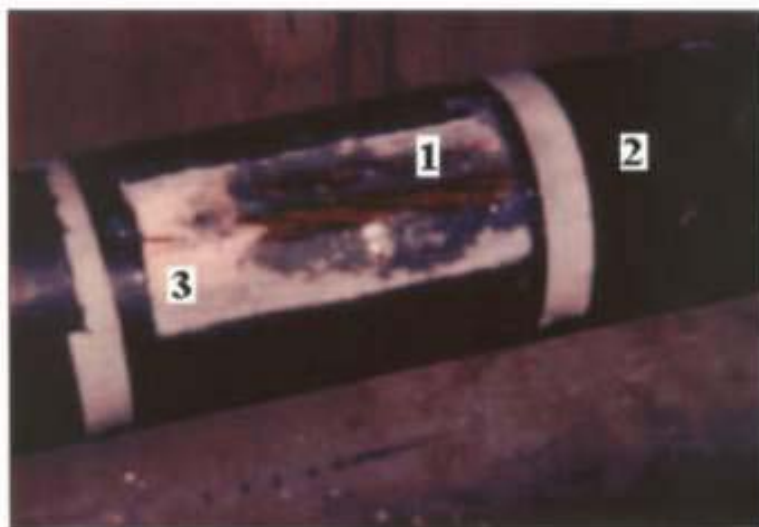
Steel cable opened to carry out the measurement of axial stress. 1 – analyzed steel cable; 2 – polyethylene shell of cables; 3 – cement matrix.
